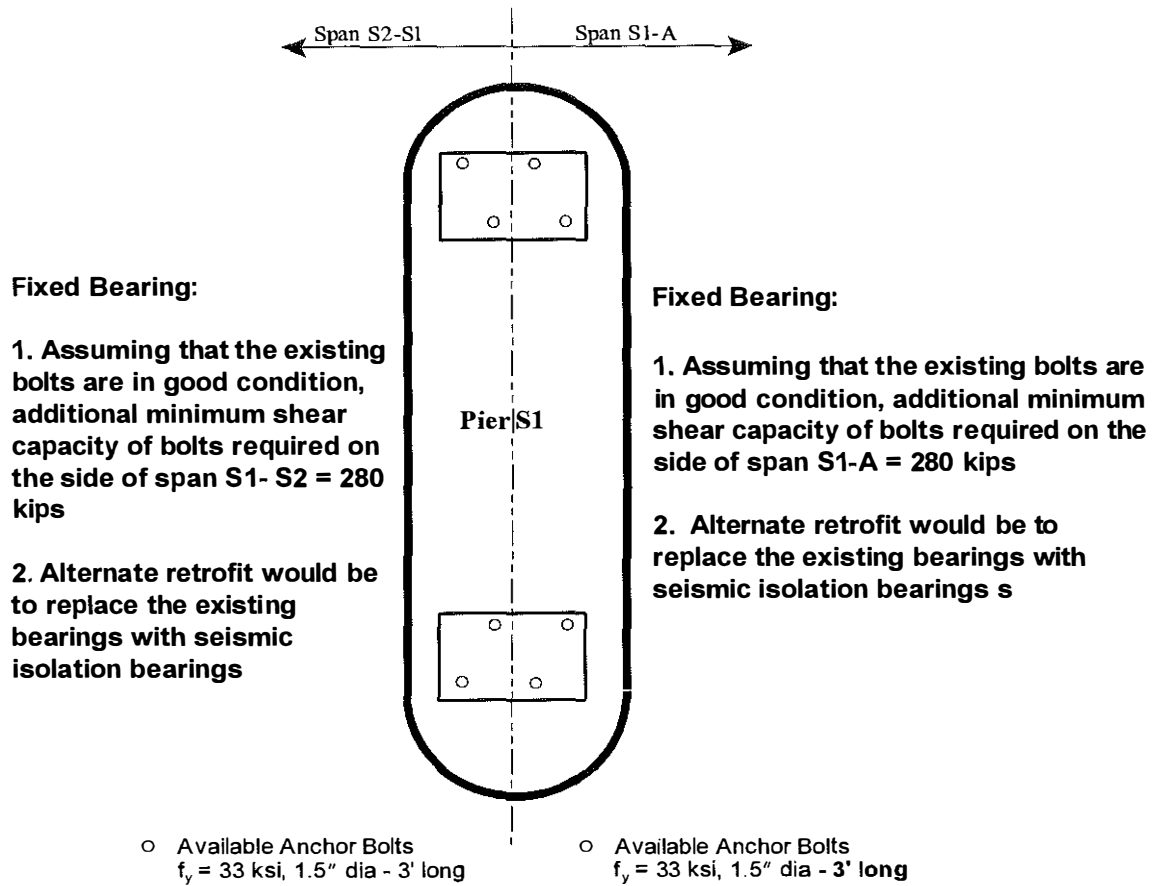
Minimum Required Shear Capacity ( $V_{req}$ ) to be Provided by Additional Anchor Bolts at Bearings of Pier S1 on the Henderson, KY Approach of the US41 Northbound Bridge
